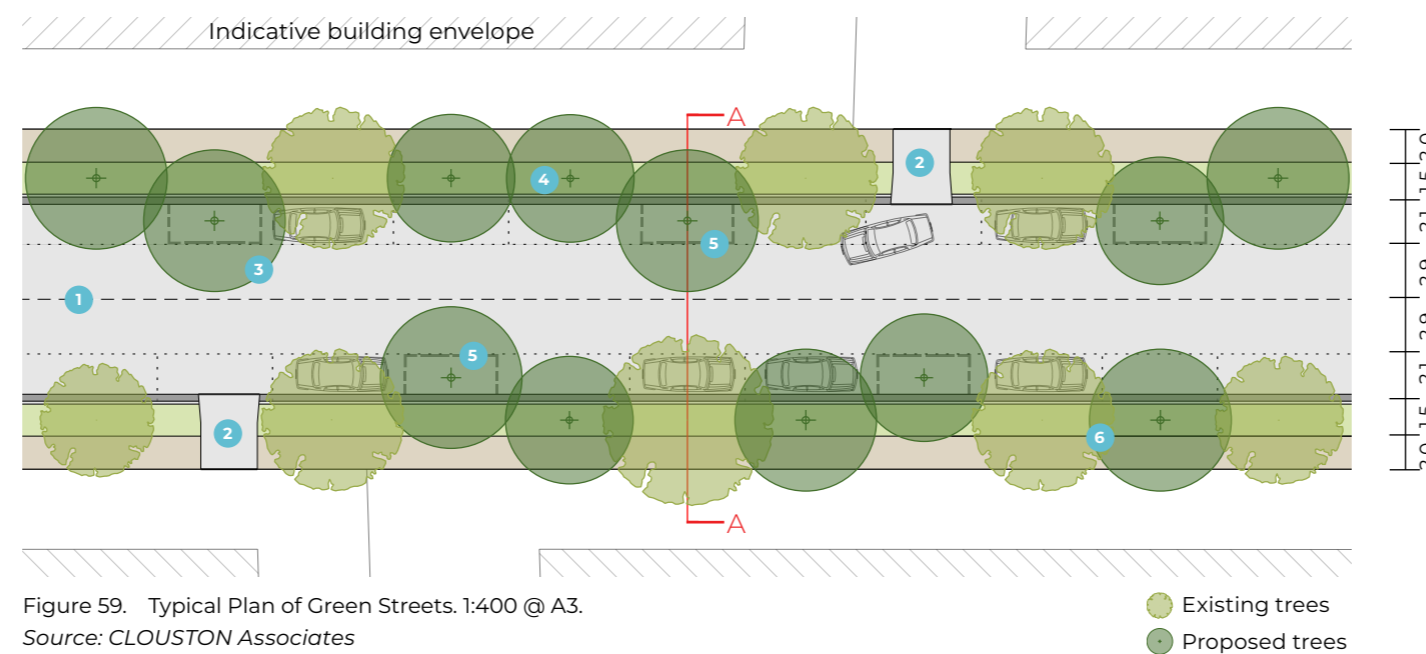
Typical Plan of Green Streets. 1:400 @ A3.
